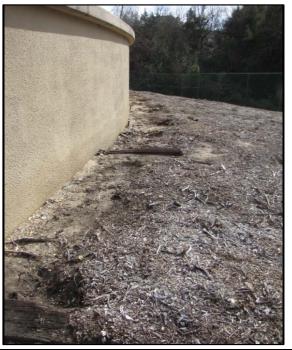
Category: Structural	Shell - 6-1/2-inch Precast Composite Core Wall with 1/2-inch CL
